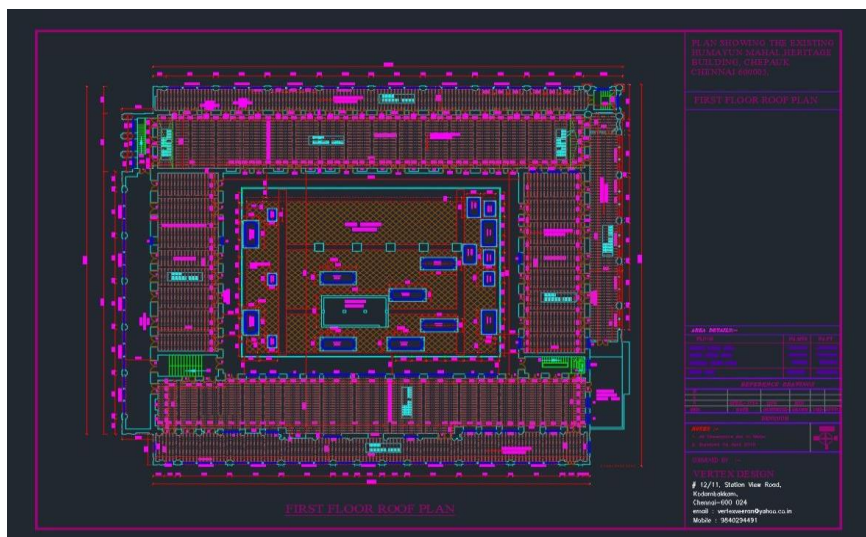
d. Shows the Plan layout of the Humayun Palace in the format of a CAD drawing.
